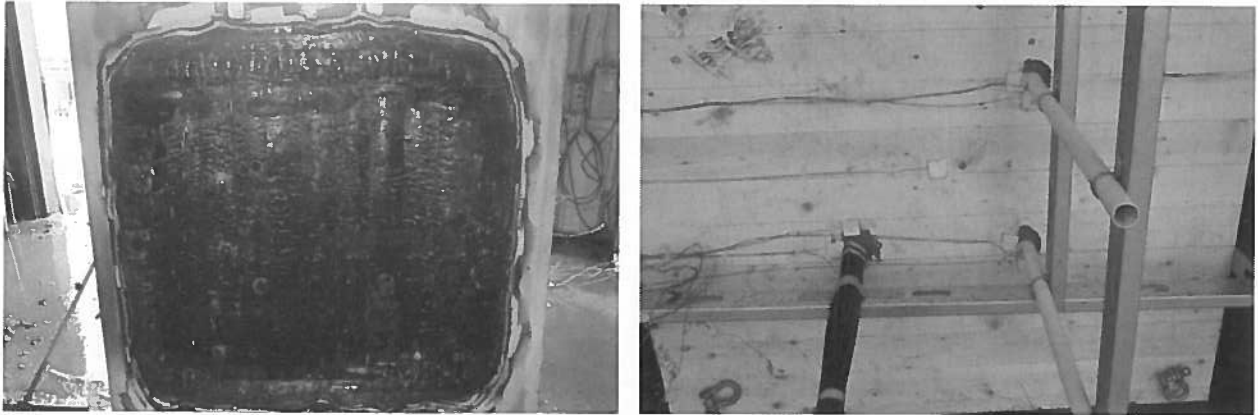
Exposed and Unexposed Side of Test Assembly Post Hose Stream Test.
